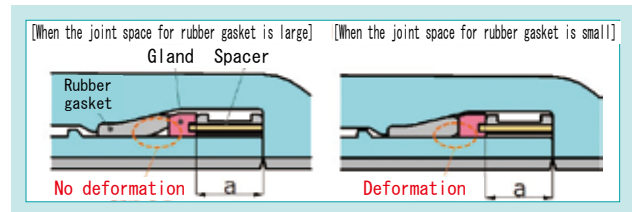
Deformation of Rubber Gasket due to Clearance Between Socket and Spigot
